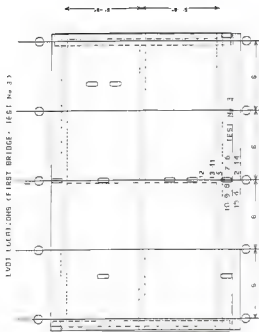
LVD1 Locations (First Bridge - Test No 3)
